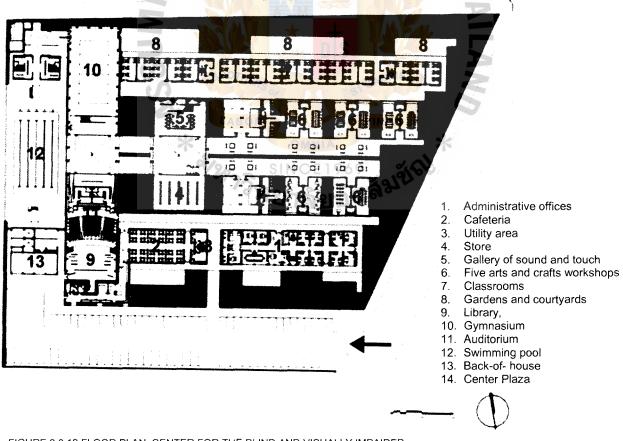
FLOOR PLAN: CENTER FOR THE BLIND AND VISUALLY IMPAIRED
